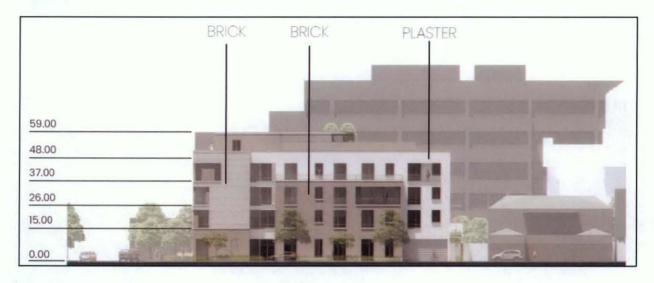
Southwest Elevation, South Oakland Avenue and El Dorado Street (Preliminary Only)
